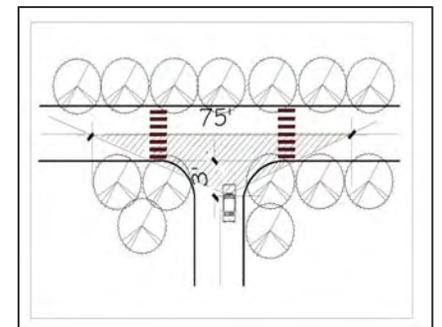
Use Street Trees to Visually Reinforce Roadway Hierarchy
